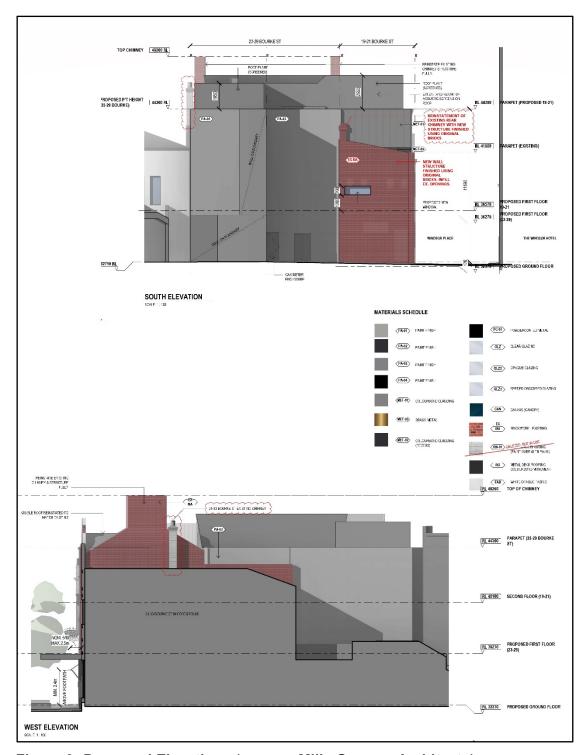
Proposed Elevations (source: Mills Gorman Architects)
